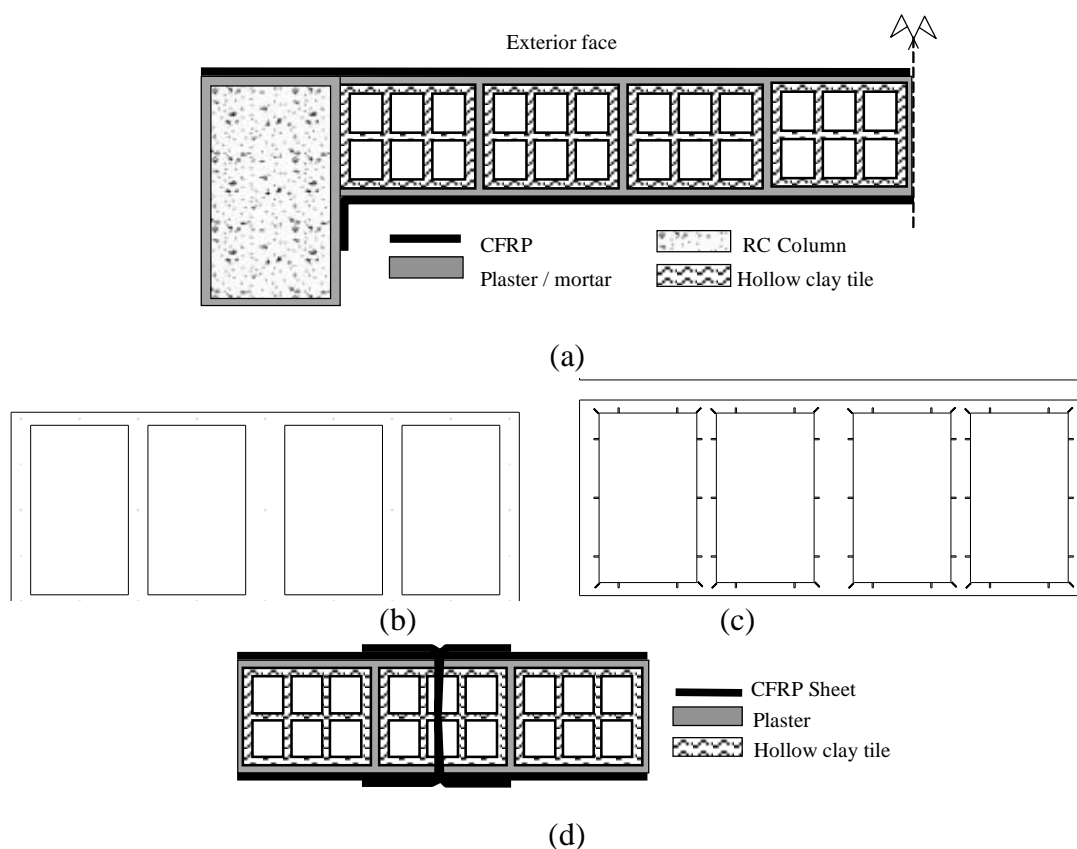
(a) CFRP pattern and, anchor dowels on the (b) exterior face; (c) interior face; (d) the infill of the Specimen SP4
